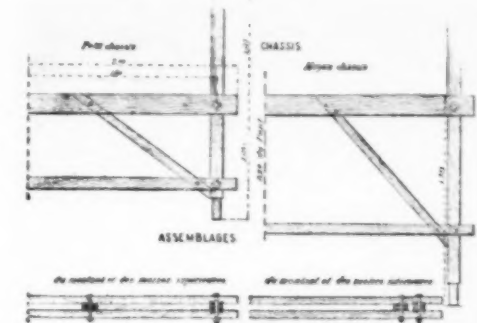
FRAME OF THE GISCLARD BRIDGE.
